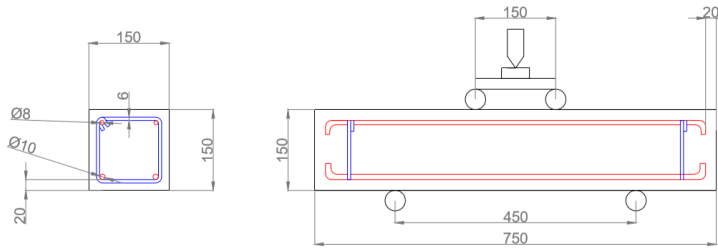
Sketch of concrete beam samples showing section reinforcement, supports span and loading points
